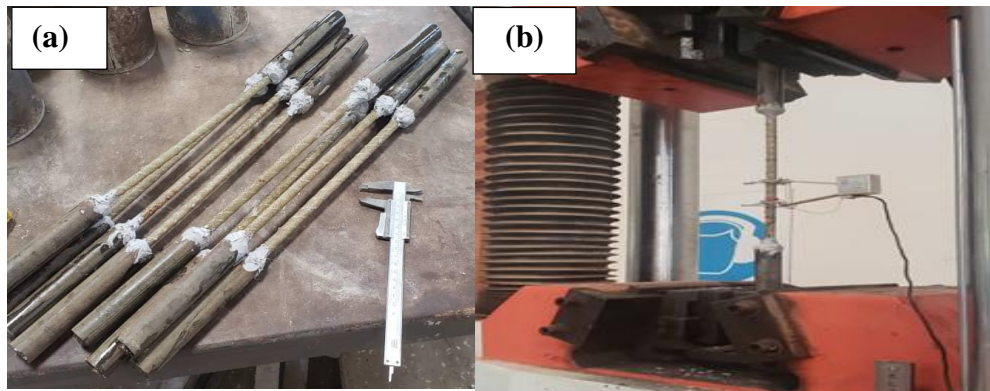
GFRP reinforcing bar tensile test using UTM: (a) preparation of test specimens, (b) testing.
